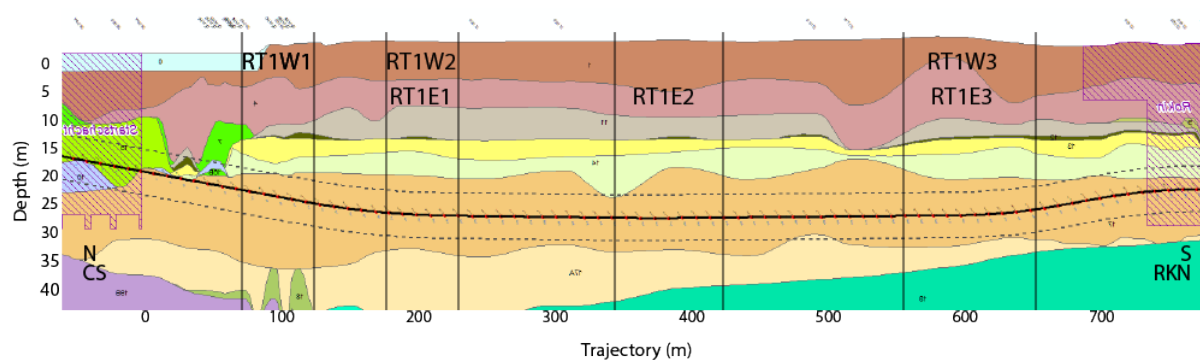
Geotechnical profile of tunnel section RT1 and zones of interest.
